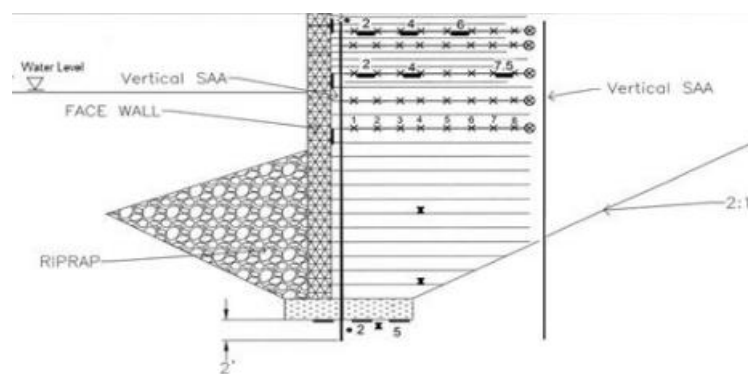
Instrumentation and Section of Maree Micheal Bridge
